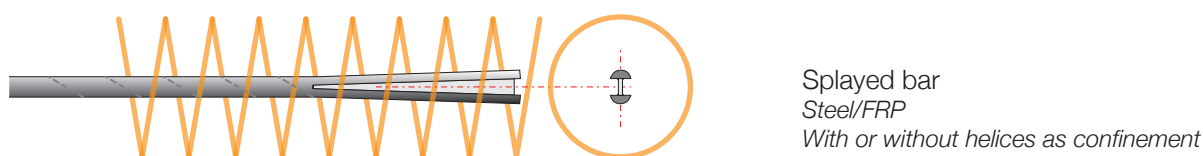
Splayed bar anchorage method for fabric formed beams.
